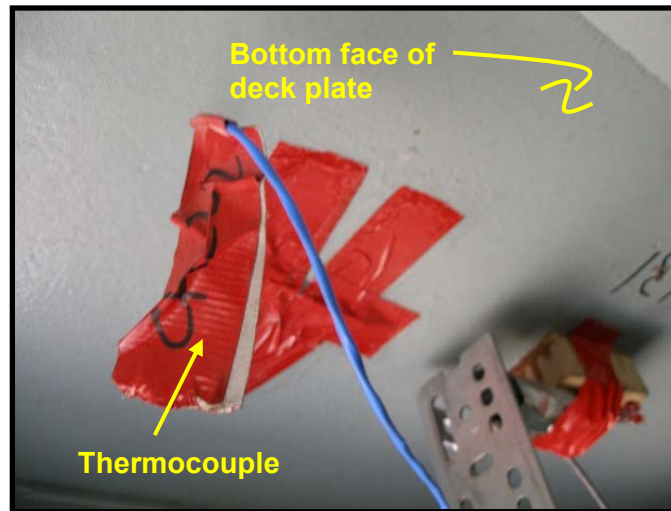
Thermocouple CH_22 installed on the bottom deck plate of Span 35
